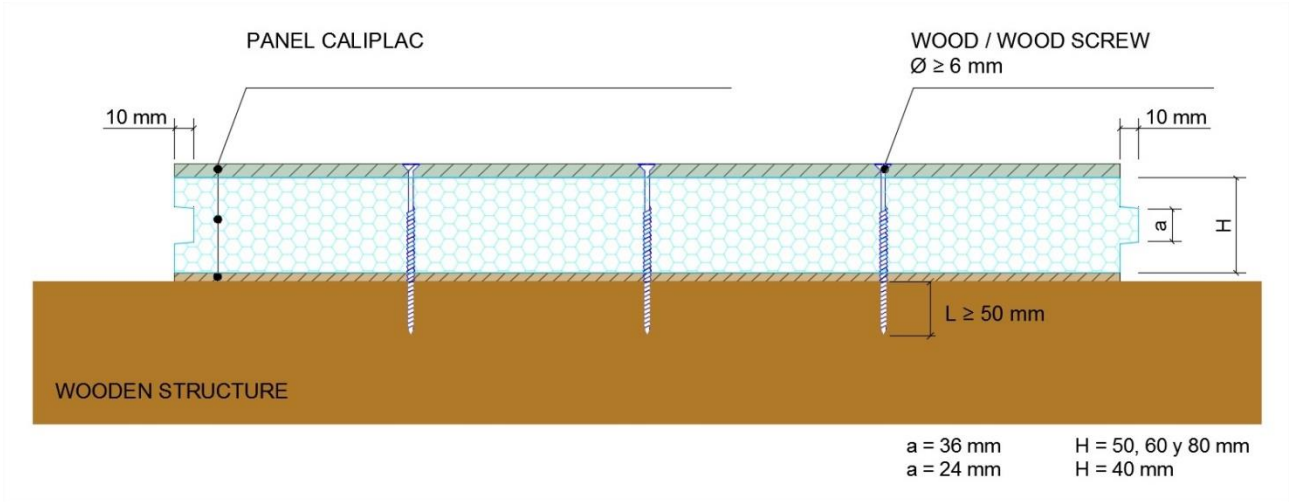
Metallic screw disposition for wooden supports and detail of tongue-and-groove joint
